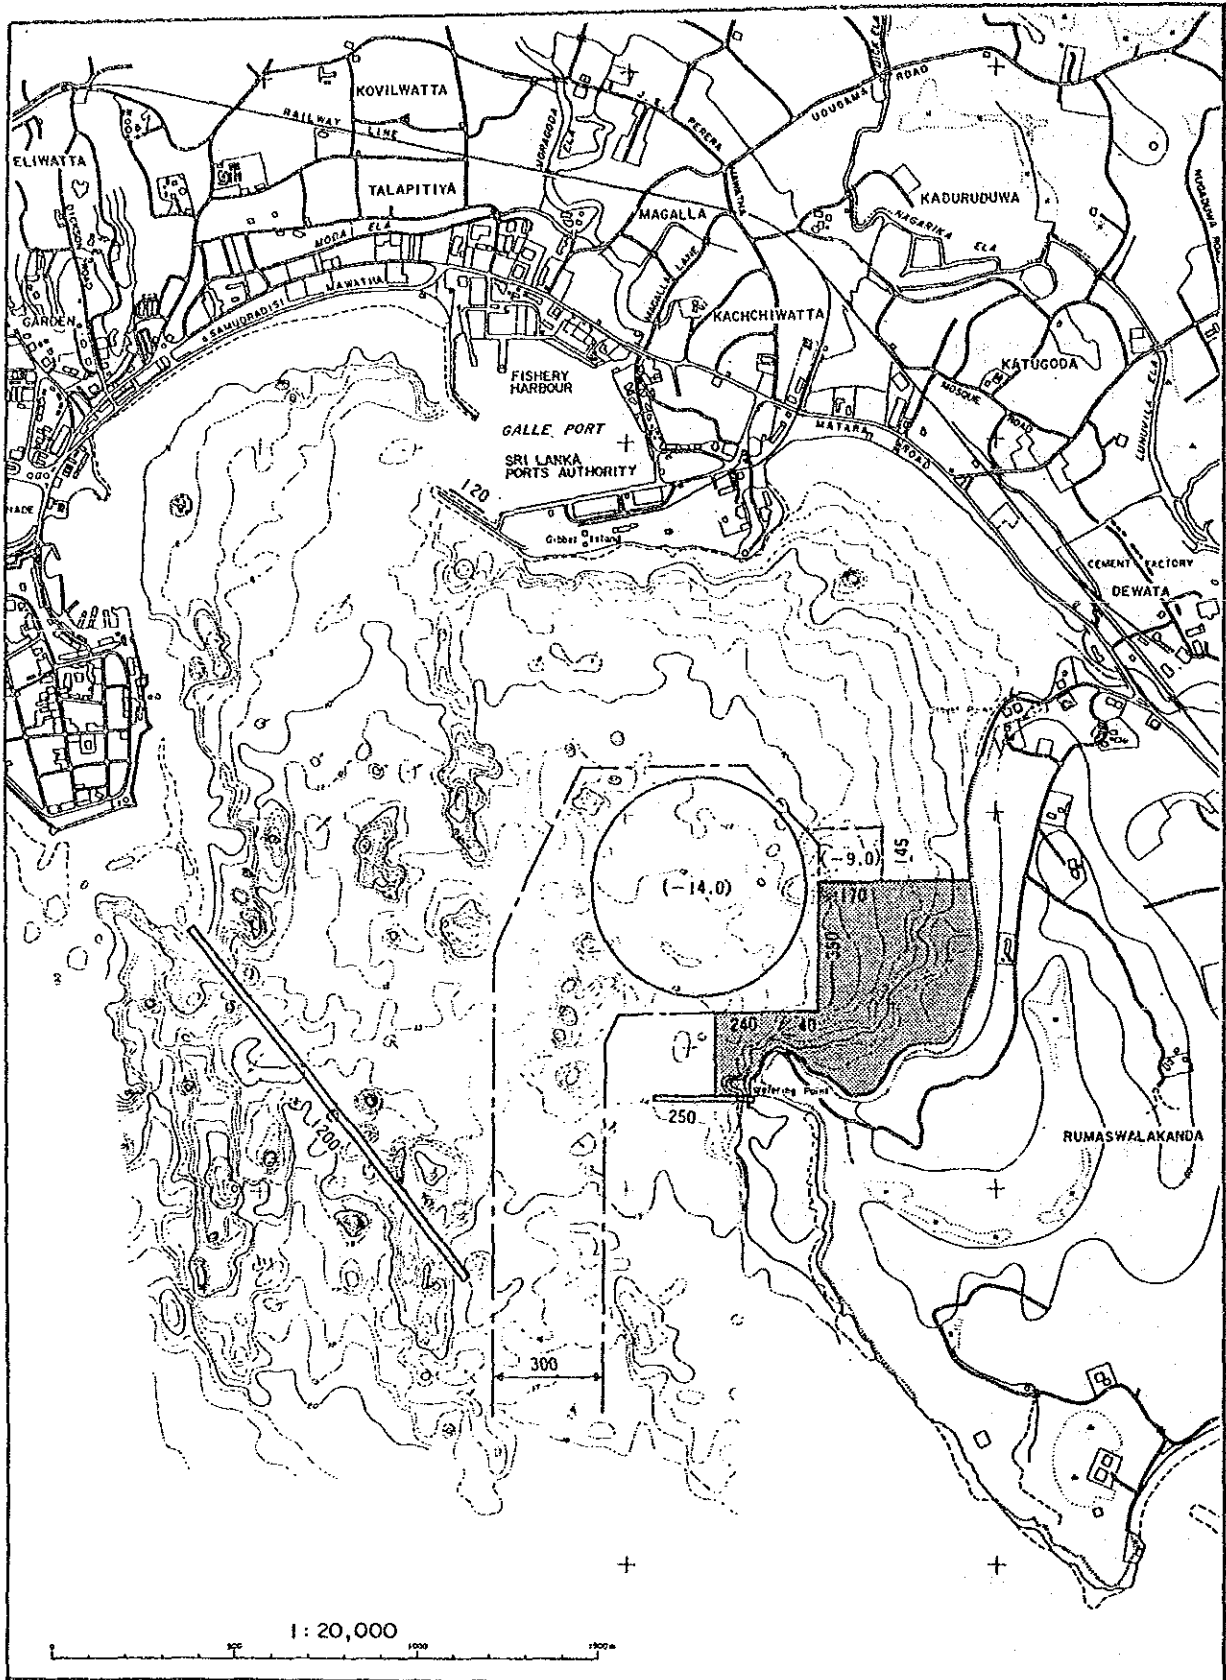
Short Term Development Plan (Alternative 1)
